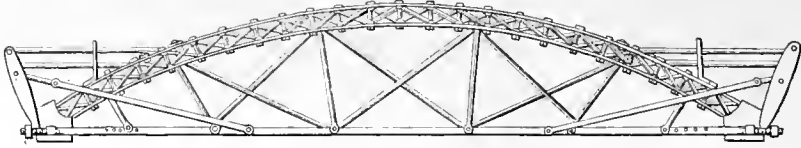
shows a deck-truss in which the railway-track is laid upon the straining-beams, which are supported by posts and braces which act as tension-bars.
